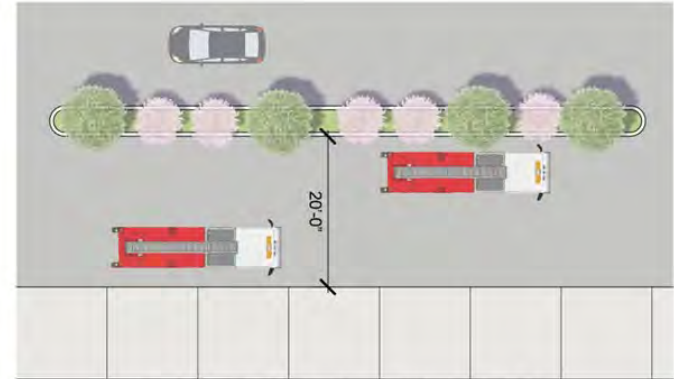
FIRE ACCESS UNOBSTRUCTED WIDTH OF 20 FT
